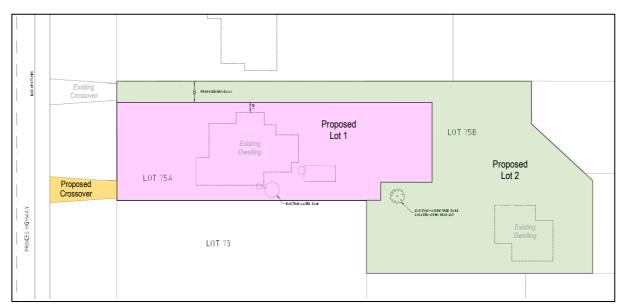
Simplified site plan, showing proposed new lots and new crossover.
